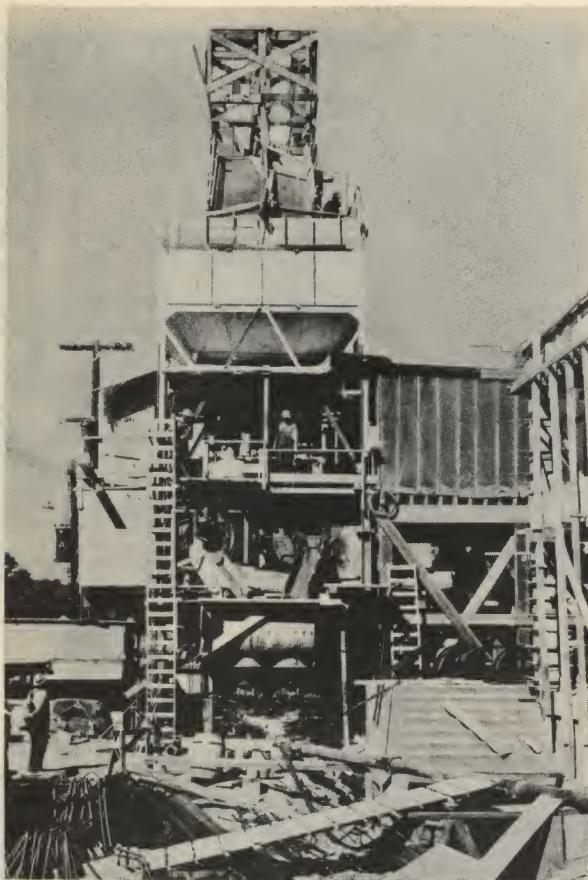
Pumpcrete housed in and decked over for Moto-Mixer delivery of concrete.
